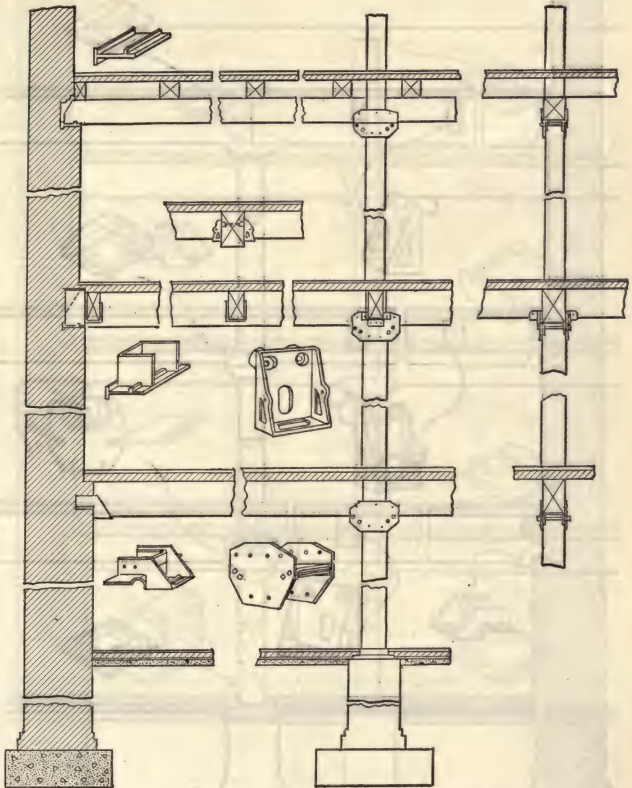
Mill-construction. Column, Girder and Joist-framing
